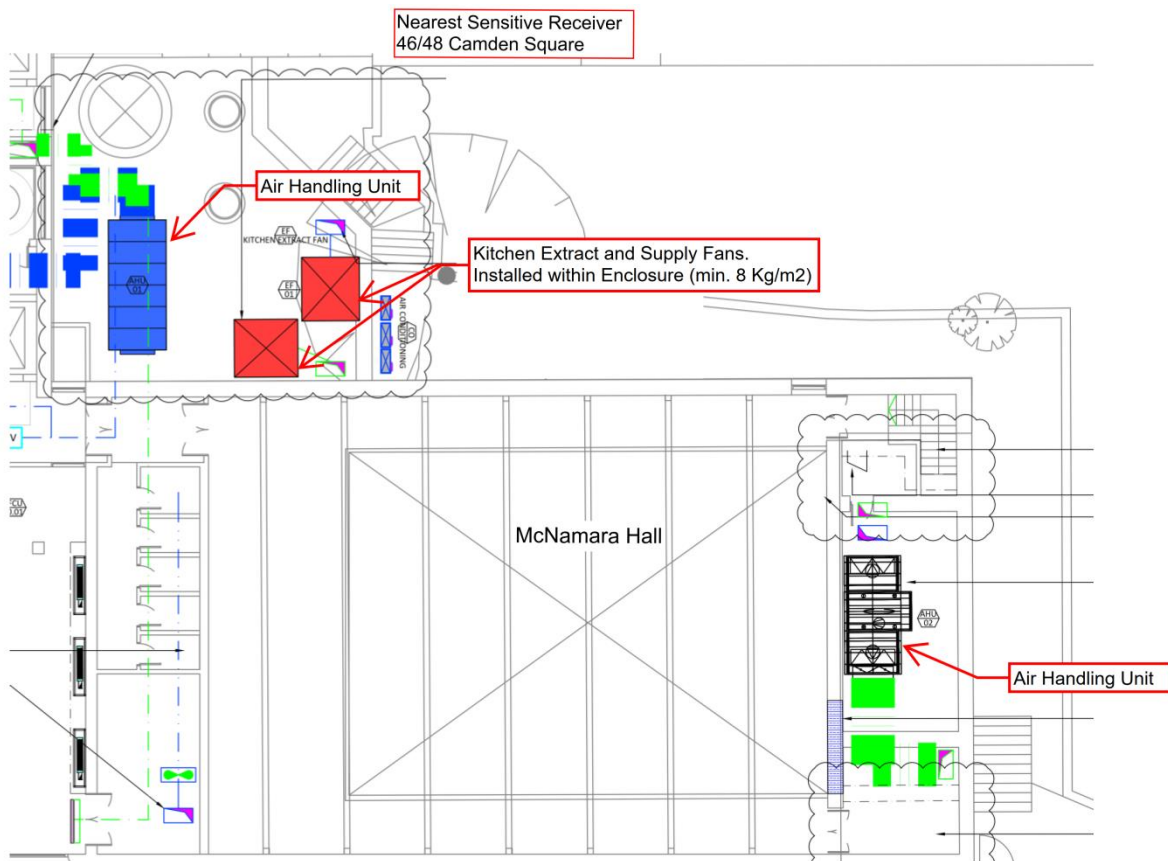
External plant equipment layout on Level 2 – areas adjacent to the McNamara Hall.
